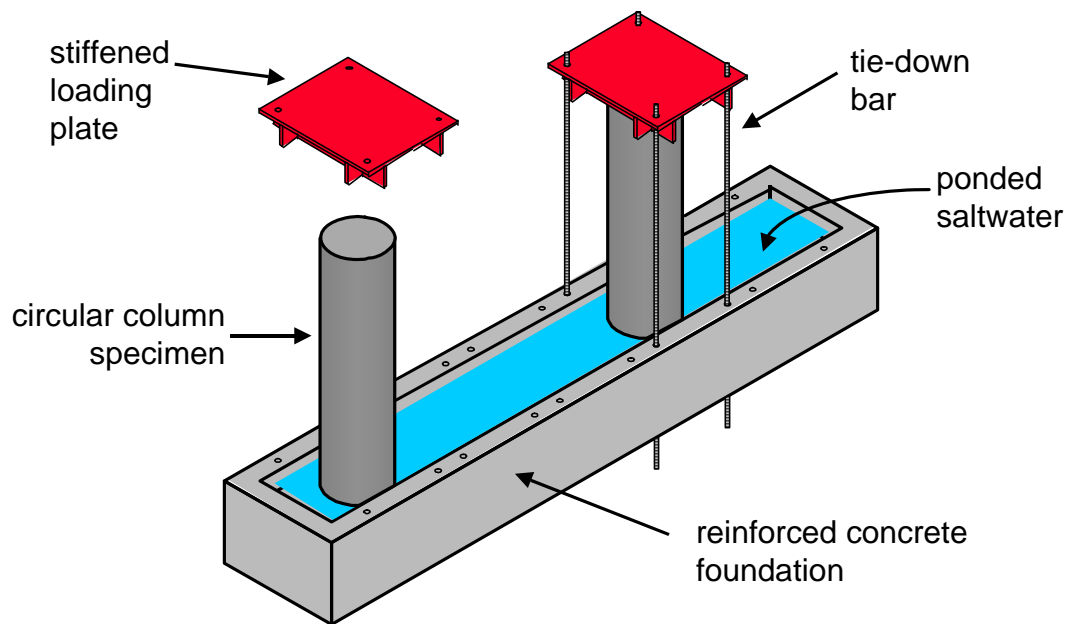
Long Term Column Corrosion Test Setup - Schematic
